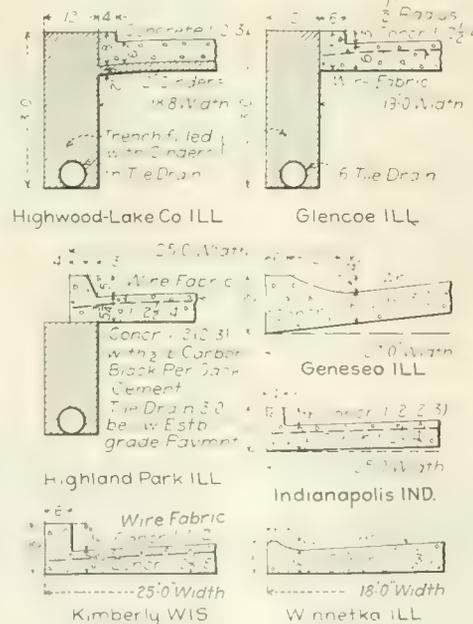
Types of Concrete Curbs Built Integral with Concrete Pavements.
